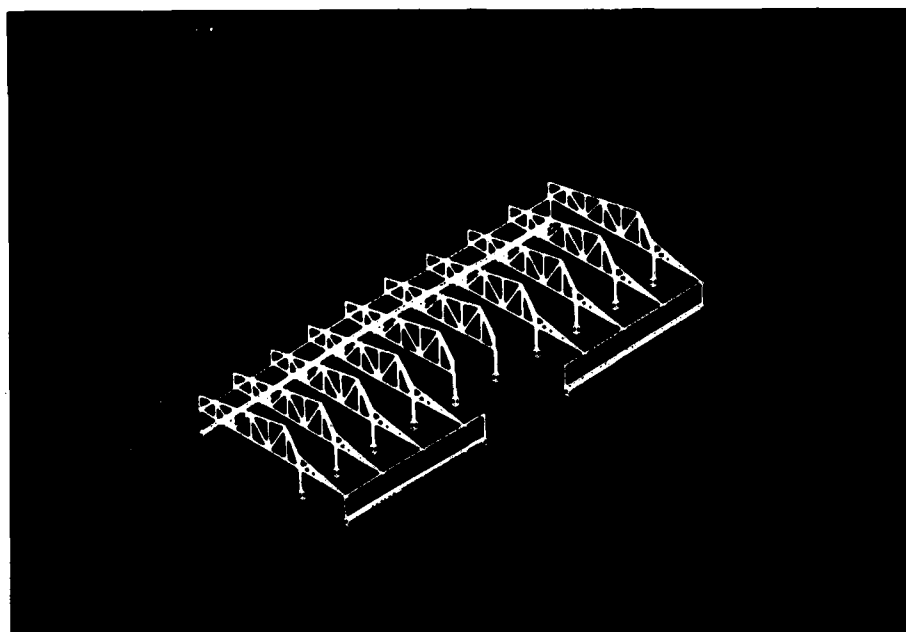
Footings, foundations, columns, and girders are sketched and extruded. Presently, sizing and layout are calculated outside CAEADS. Eventually, an automated interface will be provided.
